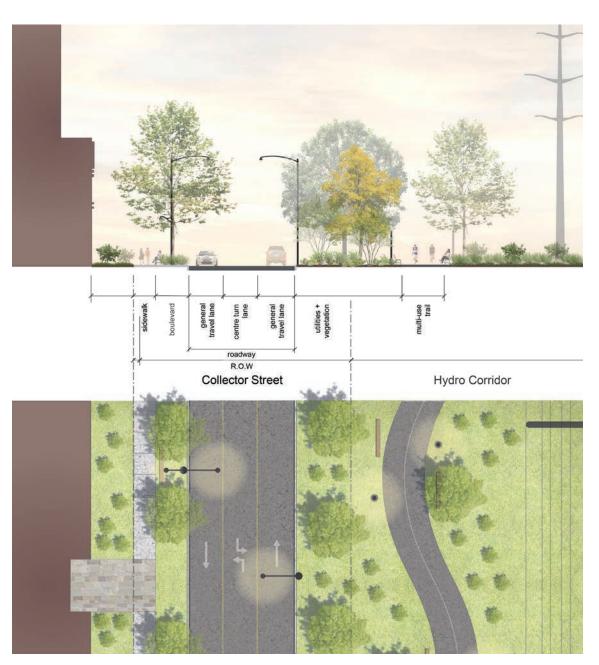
COLLECTOR STREET - BROMSGROVE ROAD FUTURE CONDITION
